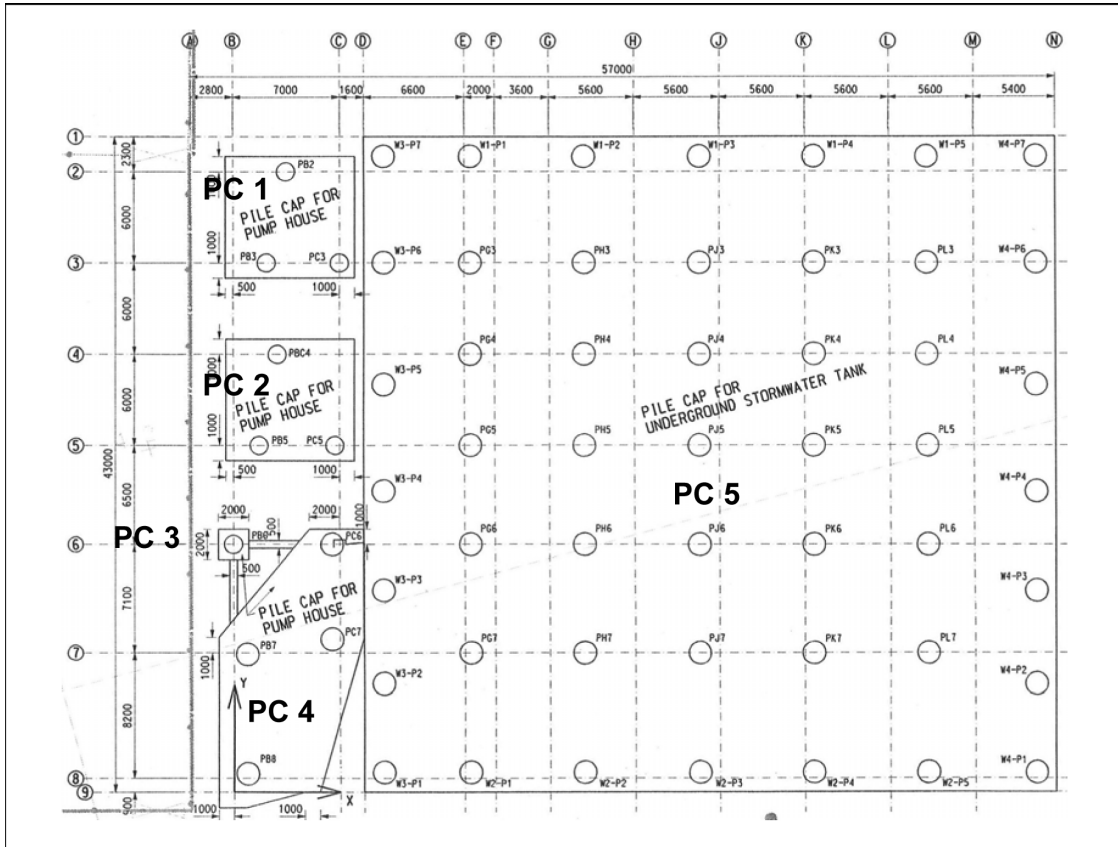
Bored Pile Layout Plan of Conforming Foundation Scheme
